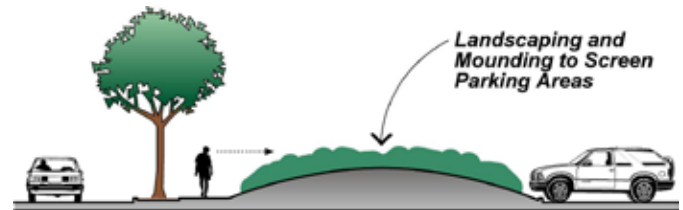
Use of berm or planter to separate and define parking from the streets.
